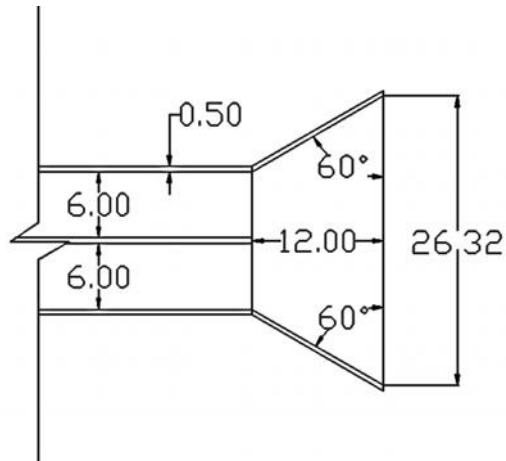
Plan View of Culvert Outlet (Downstream)
